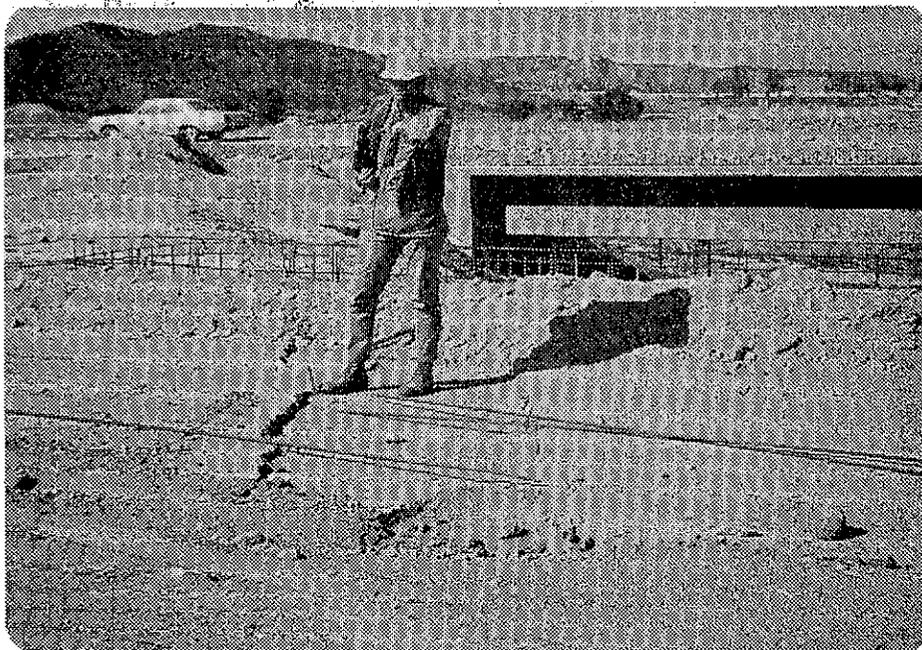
Abutment backfill settlement at the Santa Clara River Bridge (west abutment, east-bound structure).
